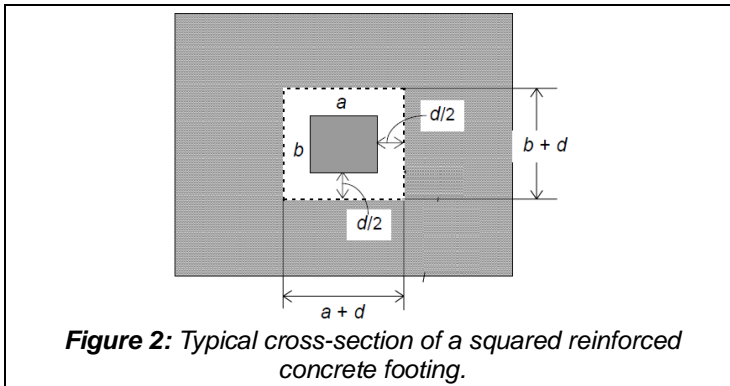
Typical cross-section of a squared reinforced concrete footing.
